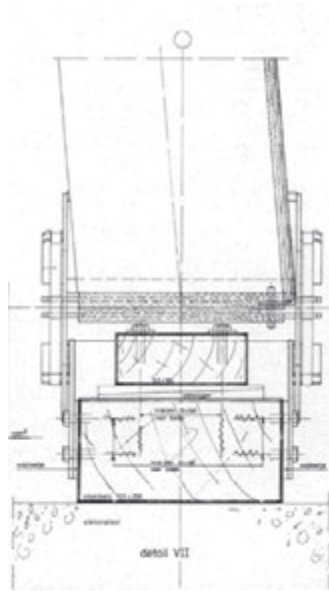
Detail showing how the members were connected to the ground, 1992
